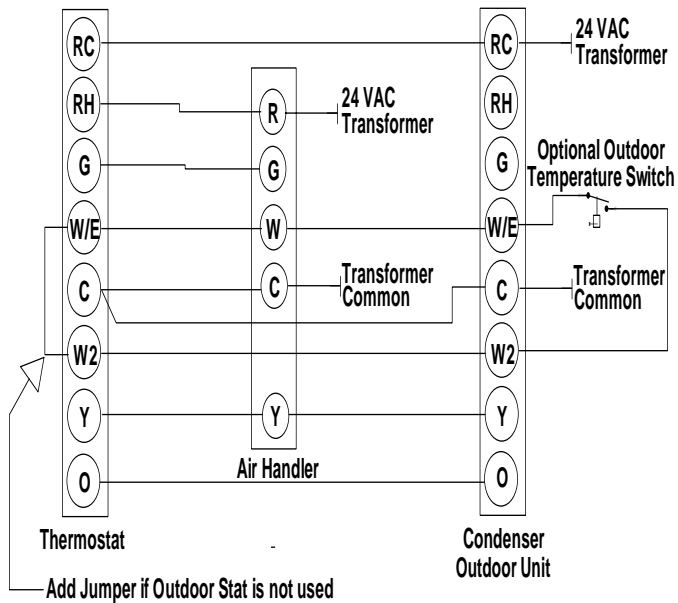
Same Thermostat; Separate Furnace and Heat Pump Unit with separate transformers
